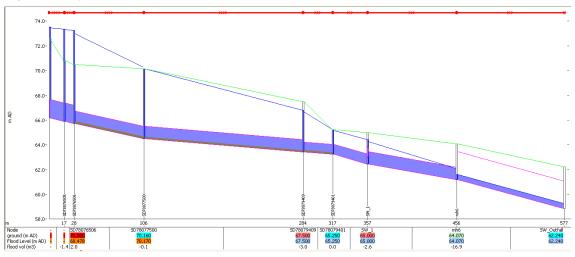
Hydraulic Grade Line in Downstream Reaches of the Culvert
